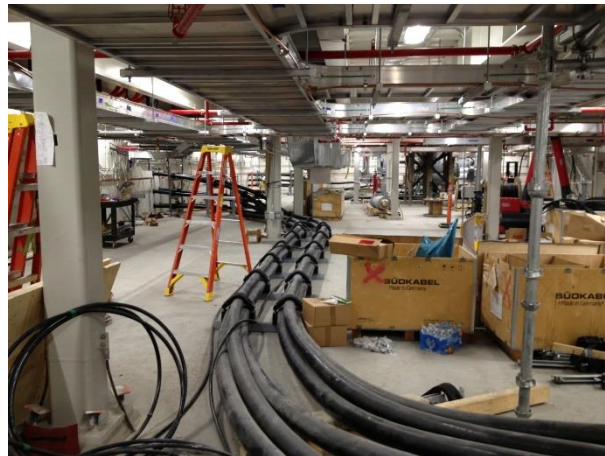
Cable pulled through basement of GIS building, July 26, 2016
